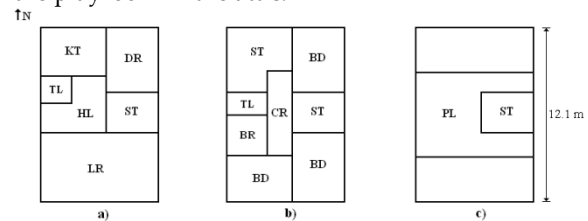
Plant of the building: a) ground floor, b) first floor and c) attic
